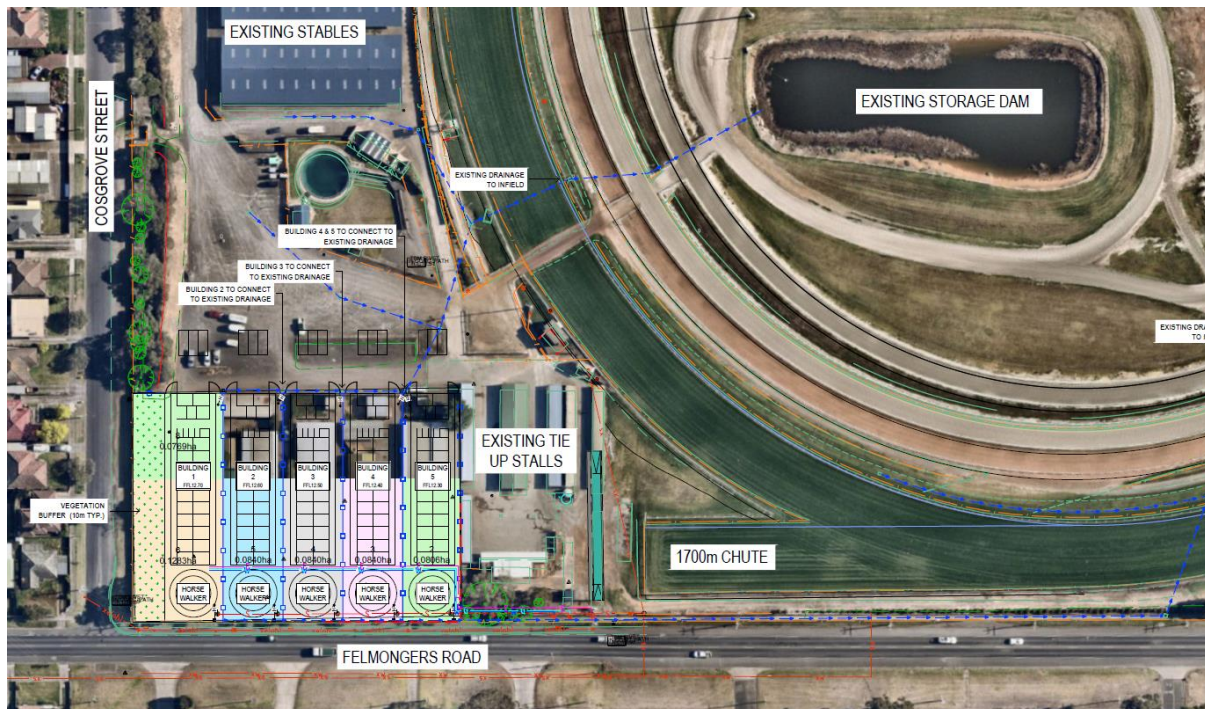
Proposed site context plan. Source: Sports Design Group, 15/12/2023.
